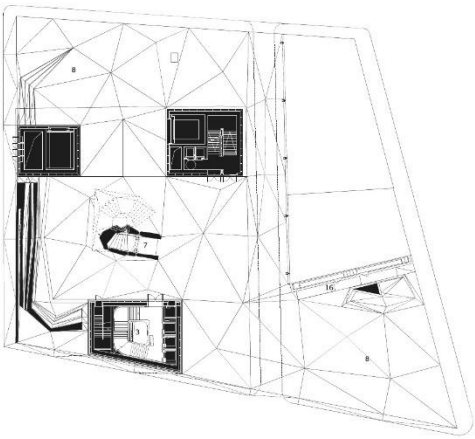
Herzog & de Meuron. (n.d.). CaixaForum Madrid – Underground Level -1 Floor Plan [Architectural drawing].
